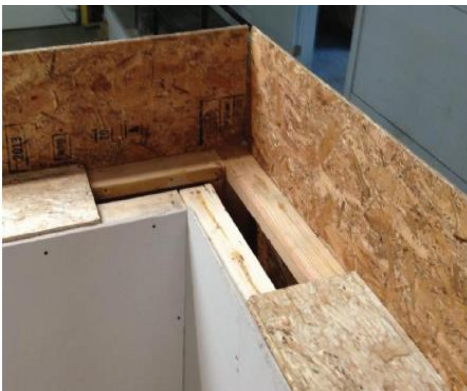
Upper section of sheathing running one foot past the top of the wall.
